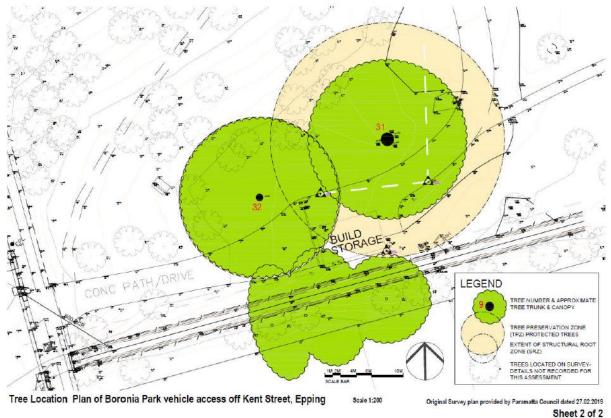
Tree locations around the proposed storage shed (southern proposed building) –
